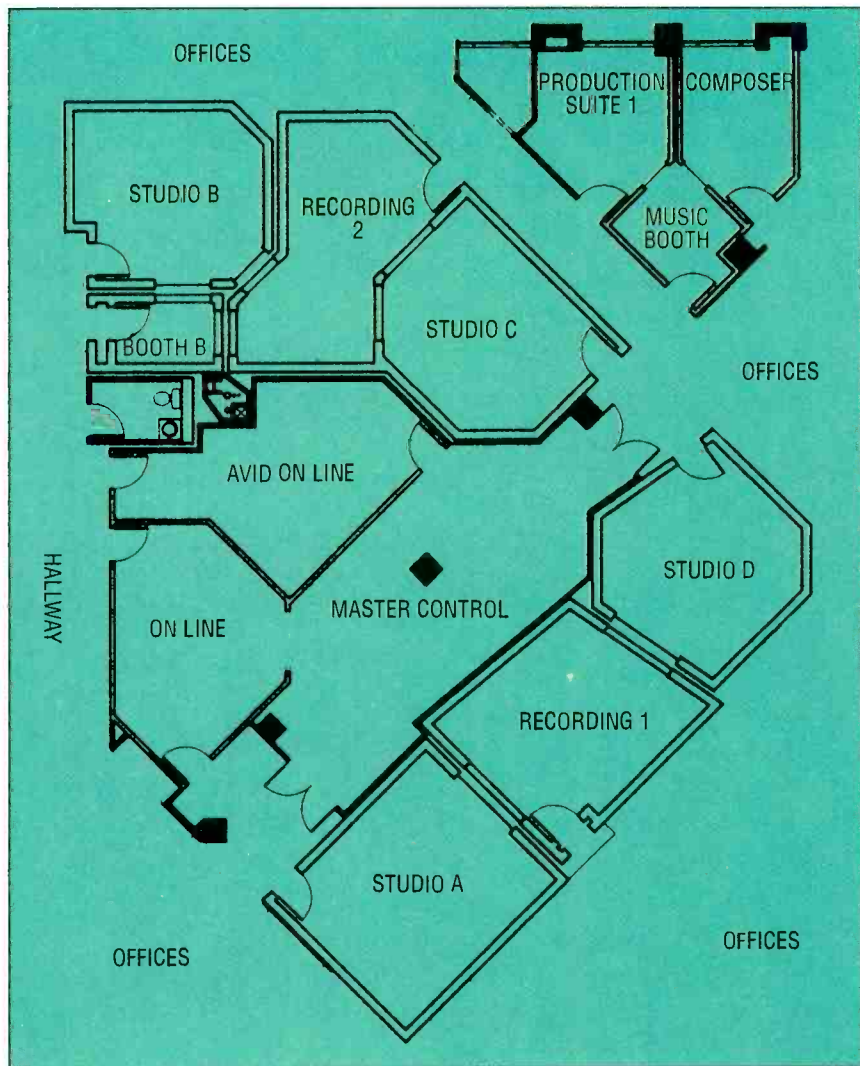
Floor plan of the new Soundwave facility in Arlington, VA.
